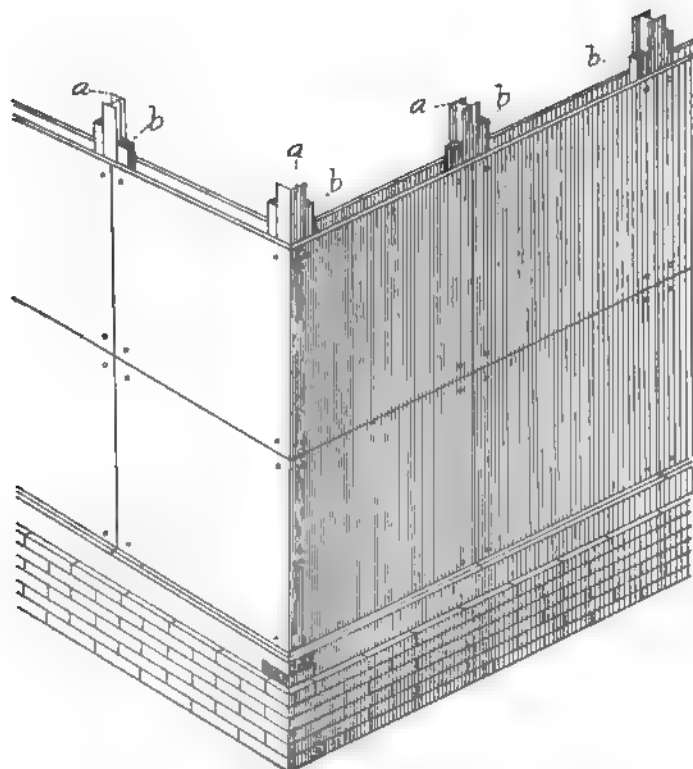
Gypsum boards fastened to narrow wooden strips in iron uprights. Such a wall is practically fire proof.
